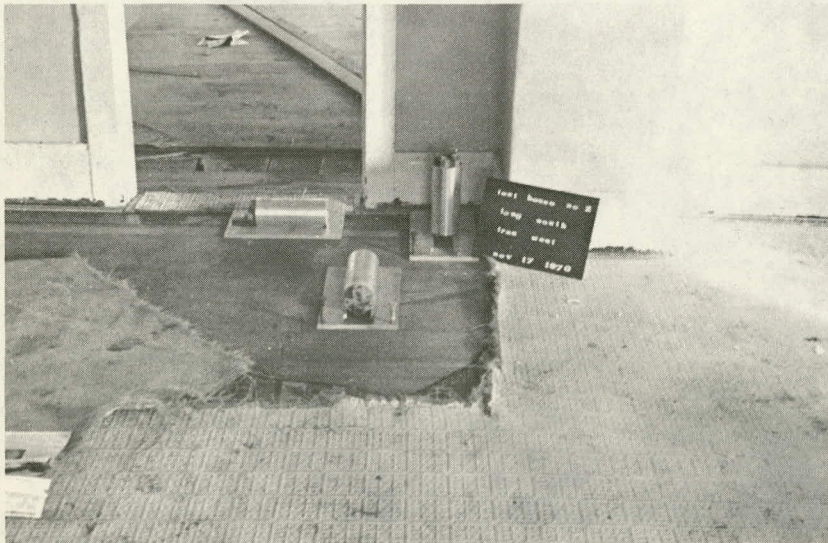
Station #2, Test House #2, seismometers on first floor, center of building.
